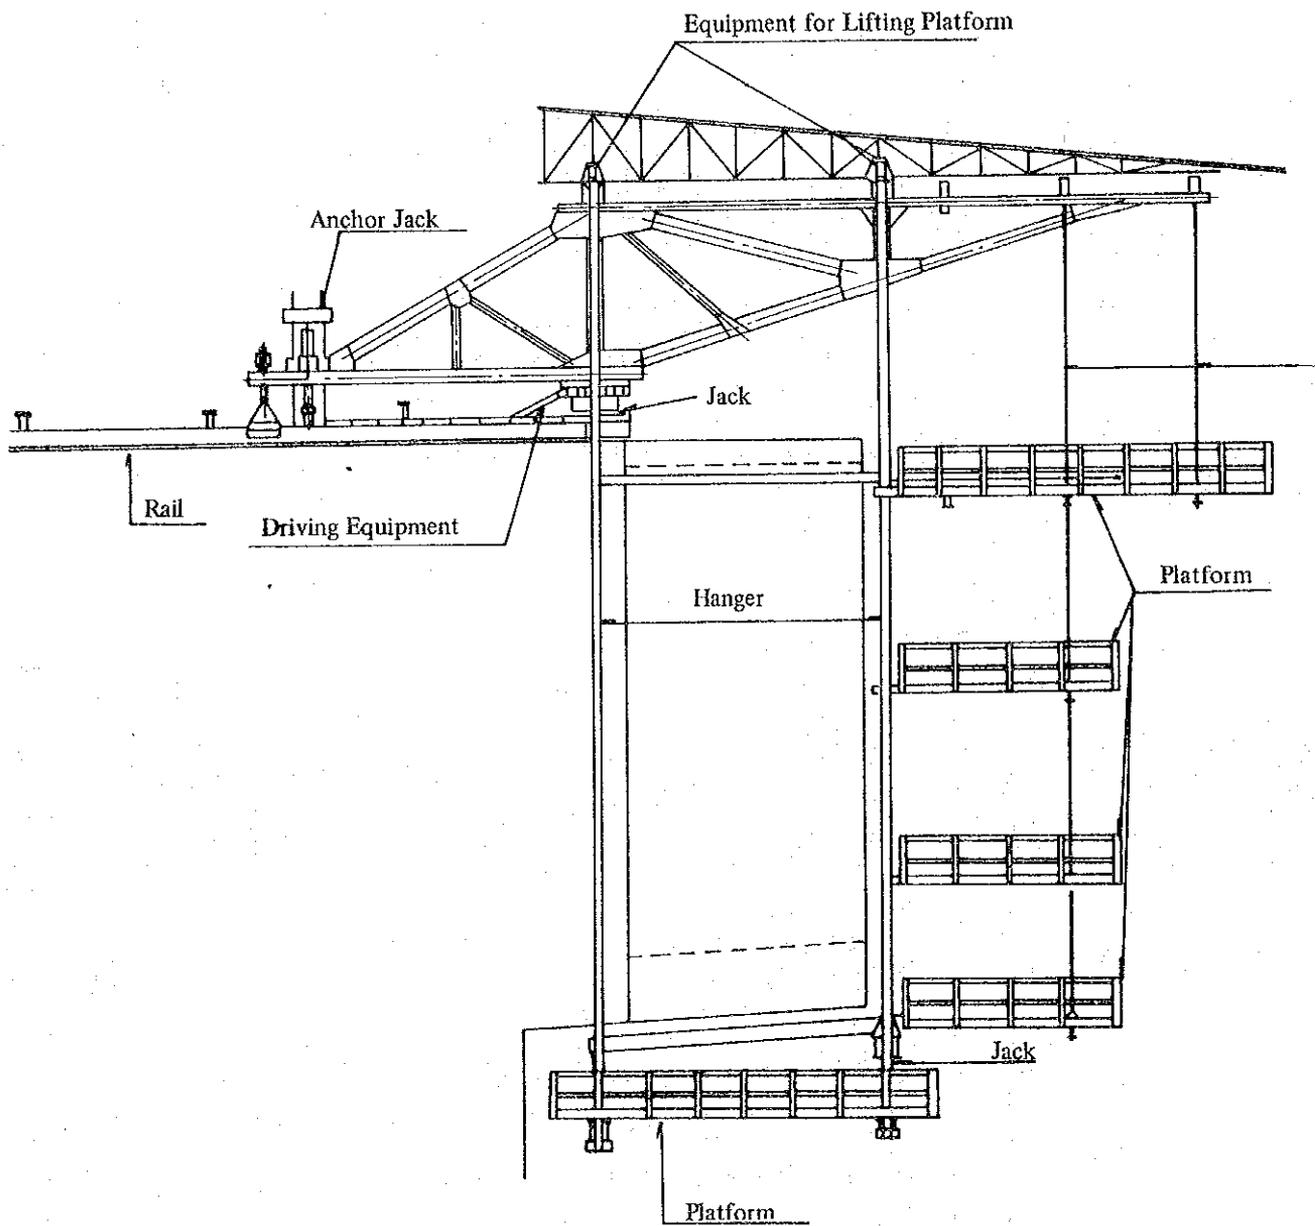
CONCEPTUAL PLAN OF CANTILEVER CARRIAGE
